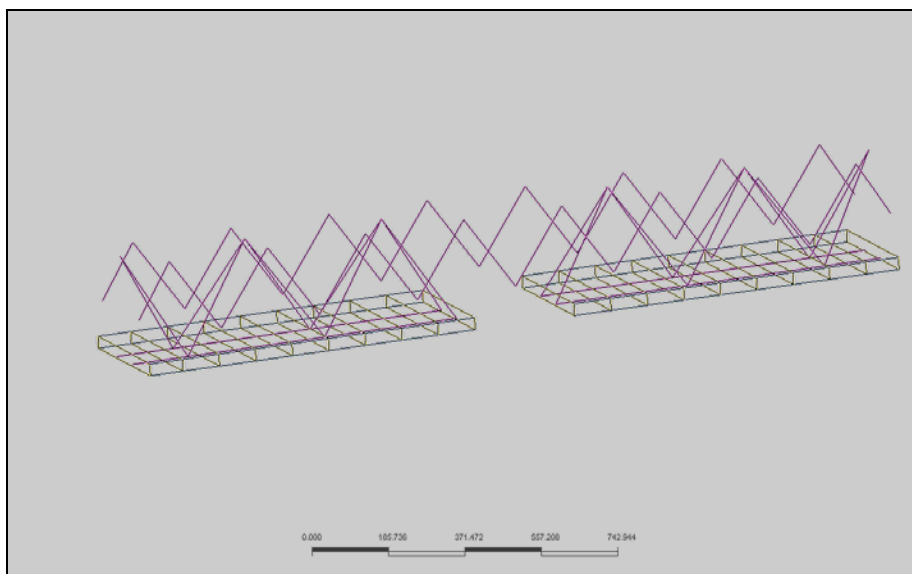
Addition of the web diagonal bars of the beam and joint trusses
